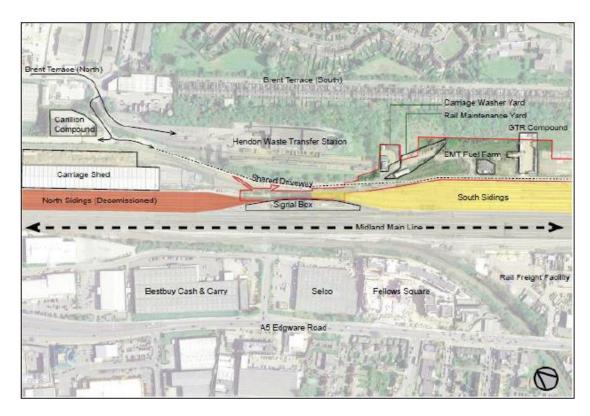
Area of the New South Sidings and MML Track Realignment Works development as consented by planning permission 18/5647/EIA.
